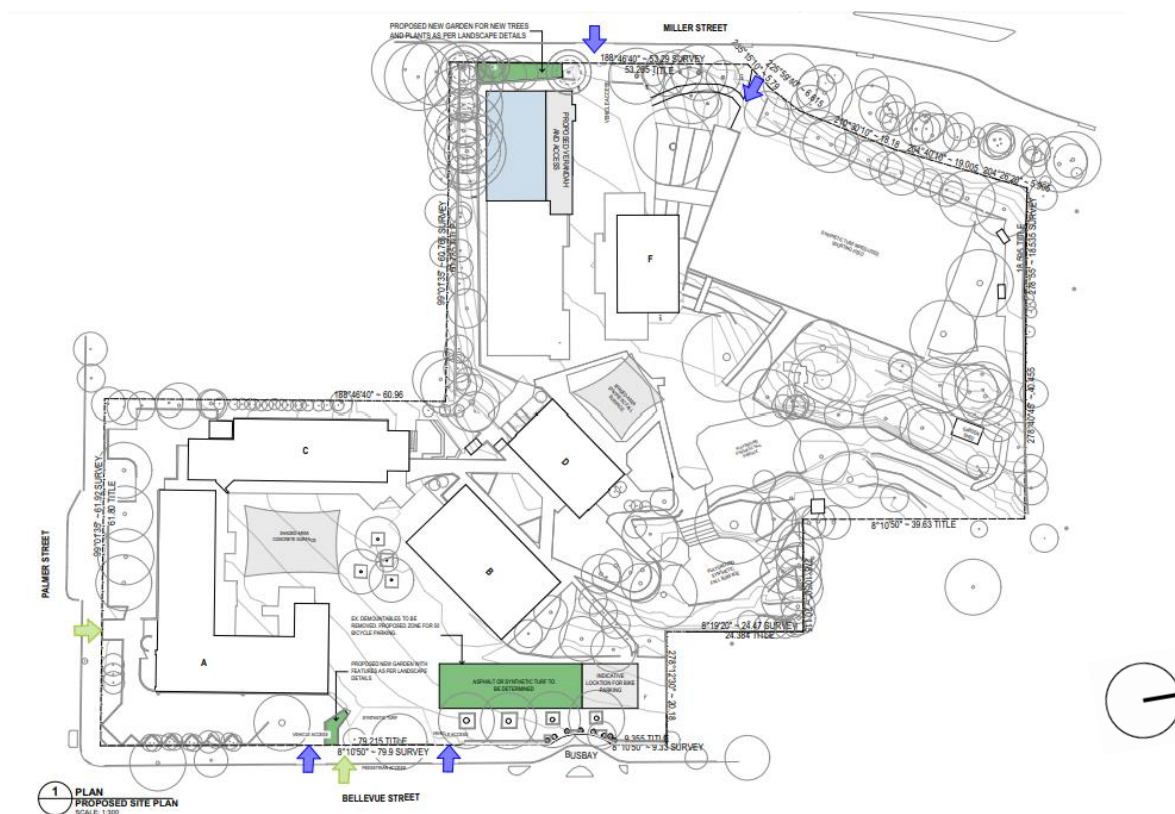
Proposed Scope of Work (Source: Fulton Trotter Architects, Proposed Site Plan (Rev P6))
